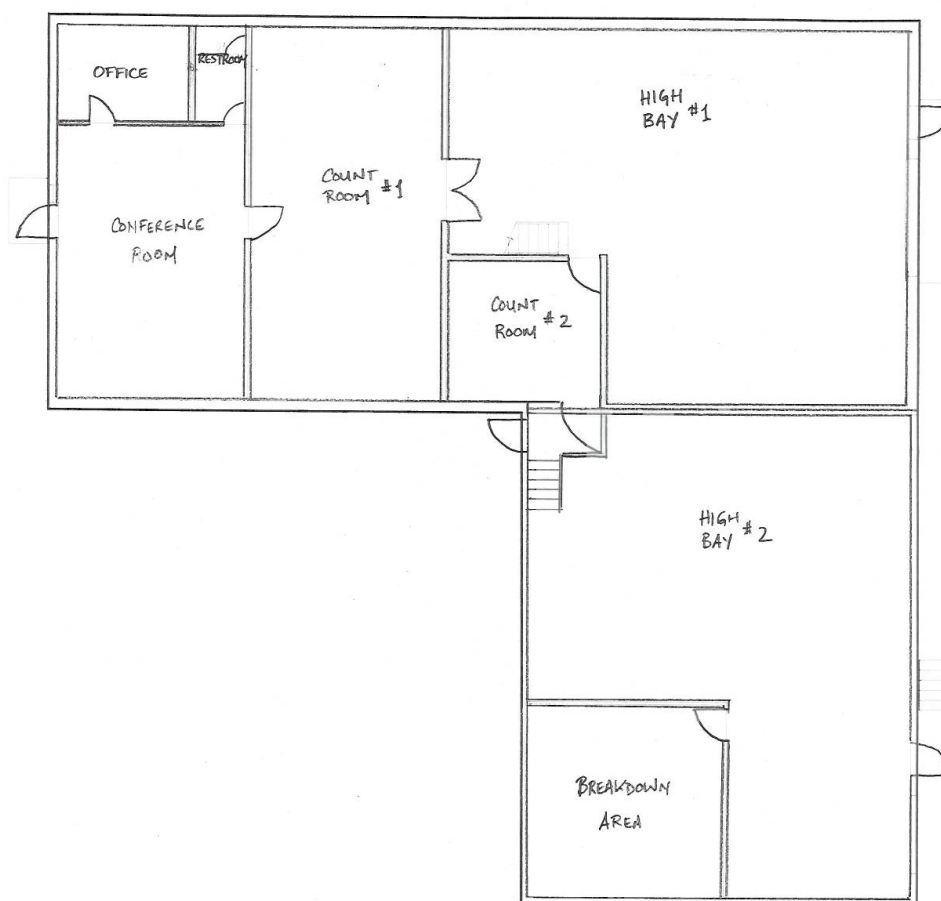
BUILDING 23-703, FIRST FLOOR, NAD LABORATORY
